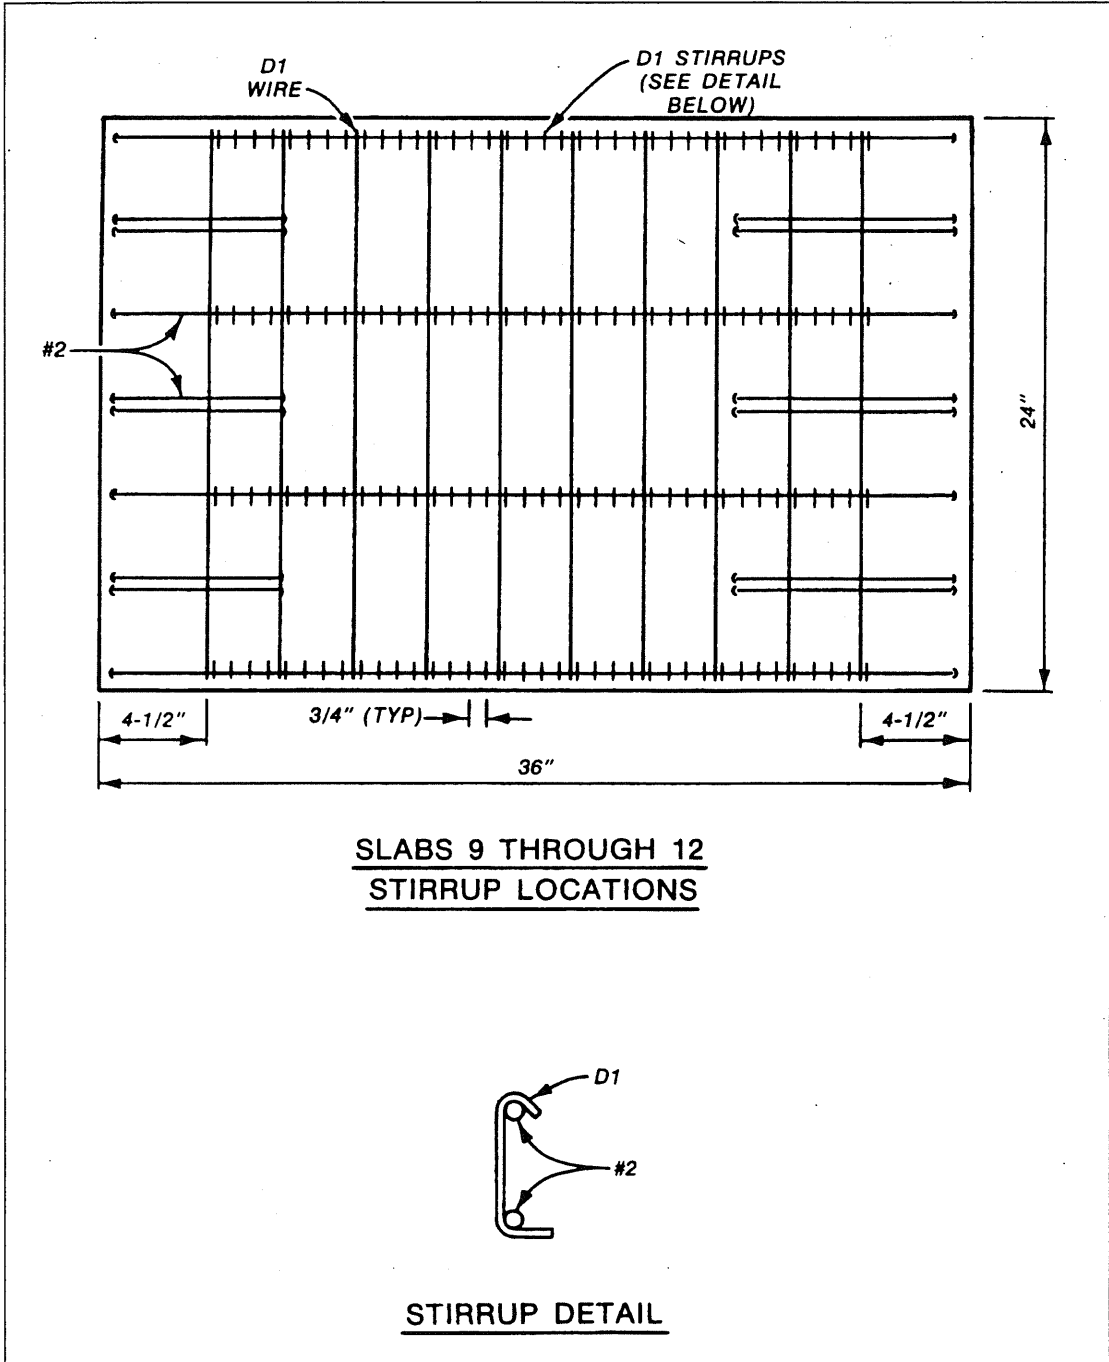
Stirrup Details, Slabs 9-12 (Woodson et. al., 1985)
